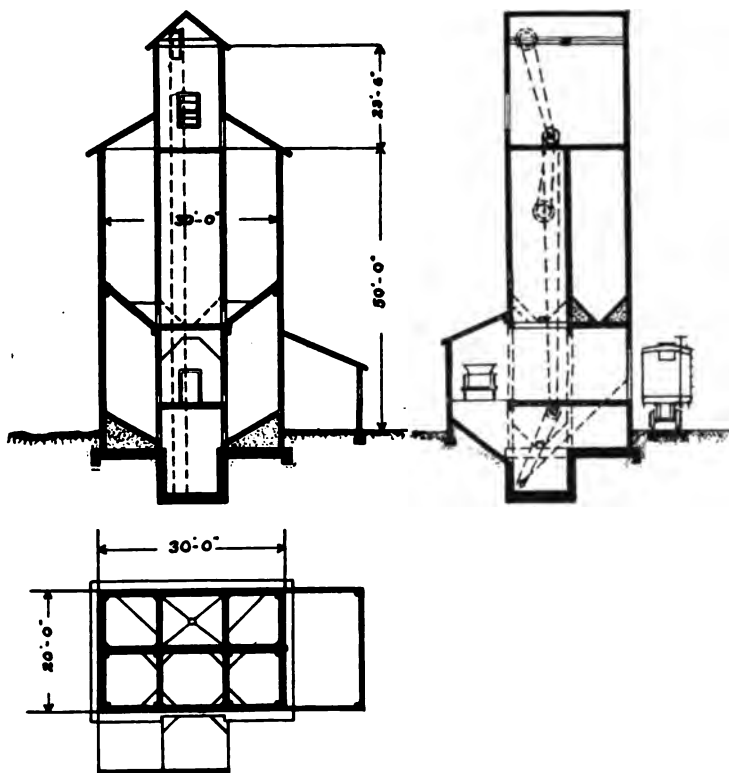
CONCRETE COUNTRY ELEVATOR.
